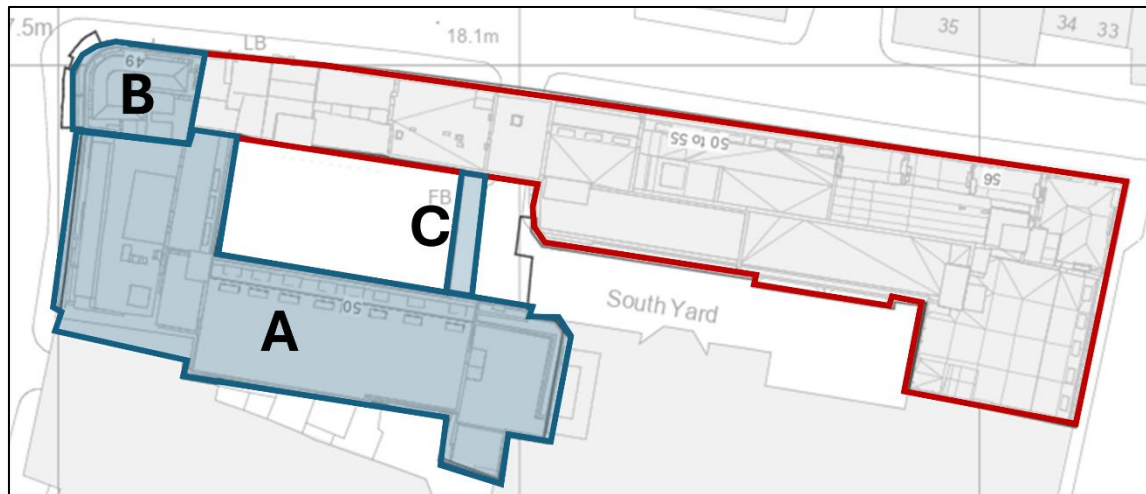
A) Whitbread Brewery Building adjacent to Kings Head PH “Boiler House”, B) The Jugged Hare Public House, C) The Bridge over the Yard
